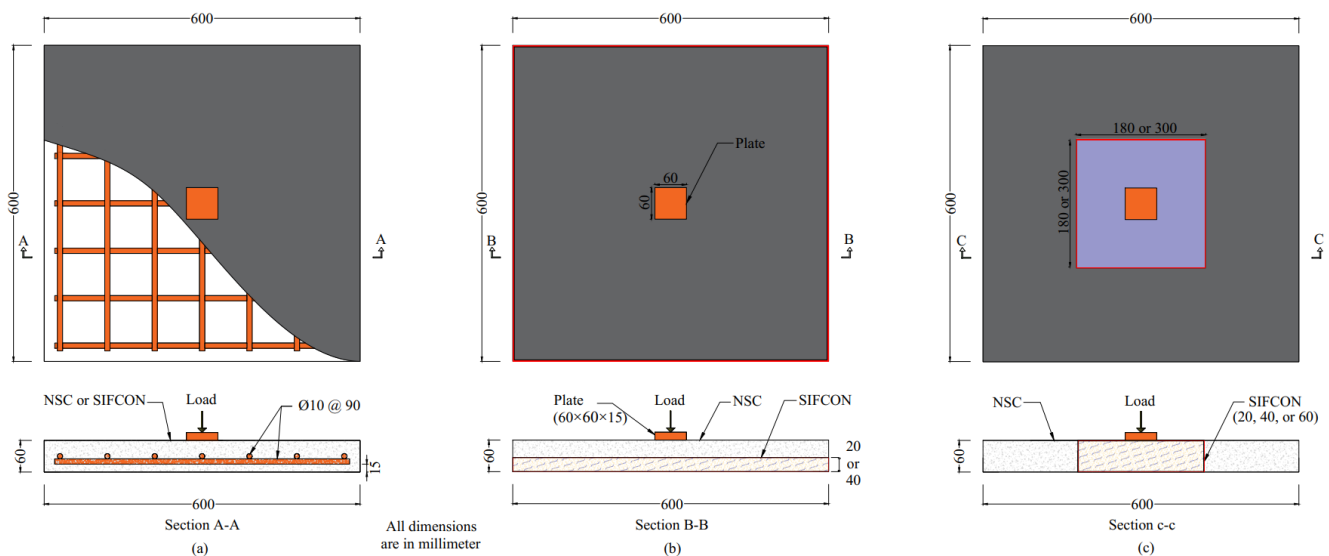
Specimen dimensions and layout: (a) Group 1 and reinforcement details; (b) Group 2; (c) Group 3
